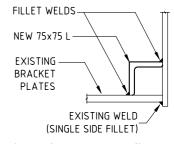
Pier 1 & 2 Diaphragm Beam Retrofit
